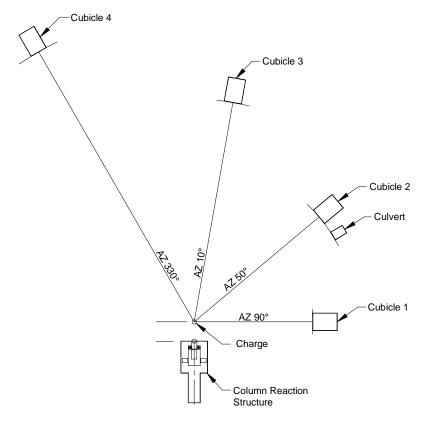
Layout of typical DIVINE BUFFALO test with cubicles.
